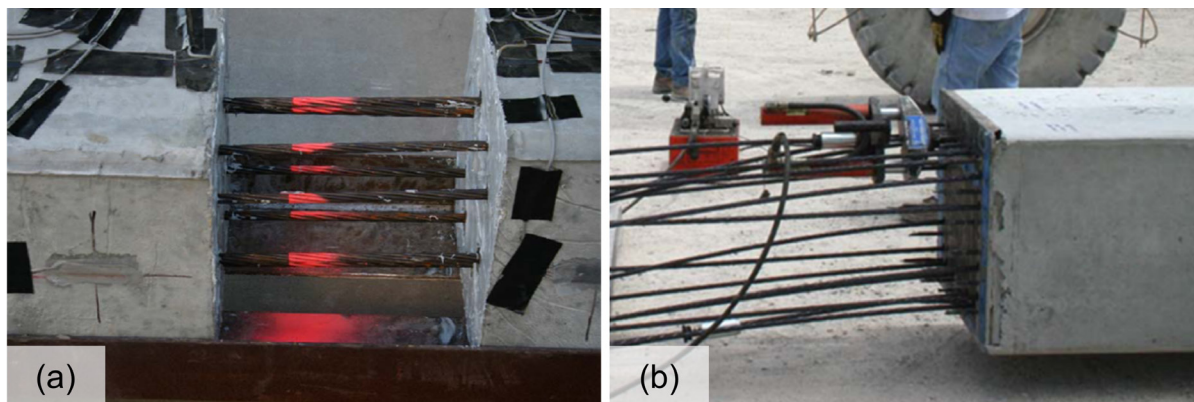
Post-tensioned splice (a) splice joint and (b) post tensioning strands in upper section (courtesy University of South Florida).
